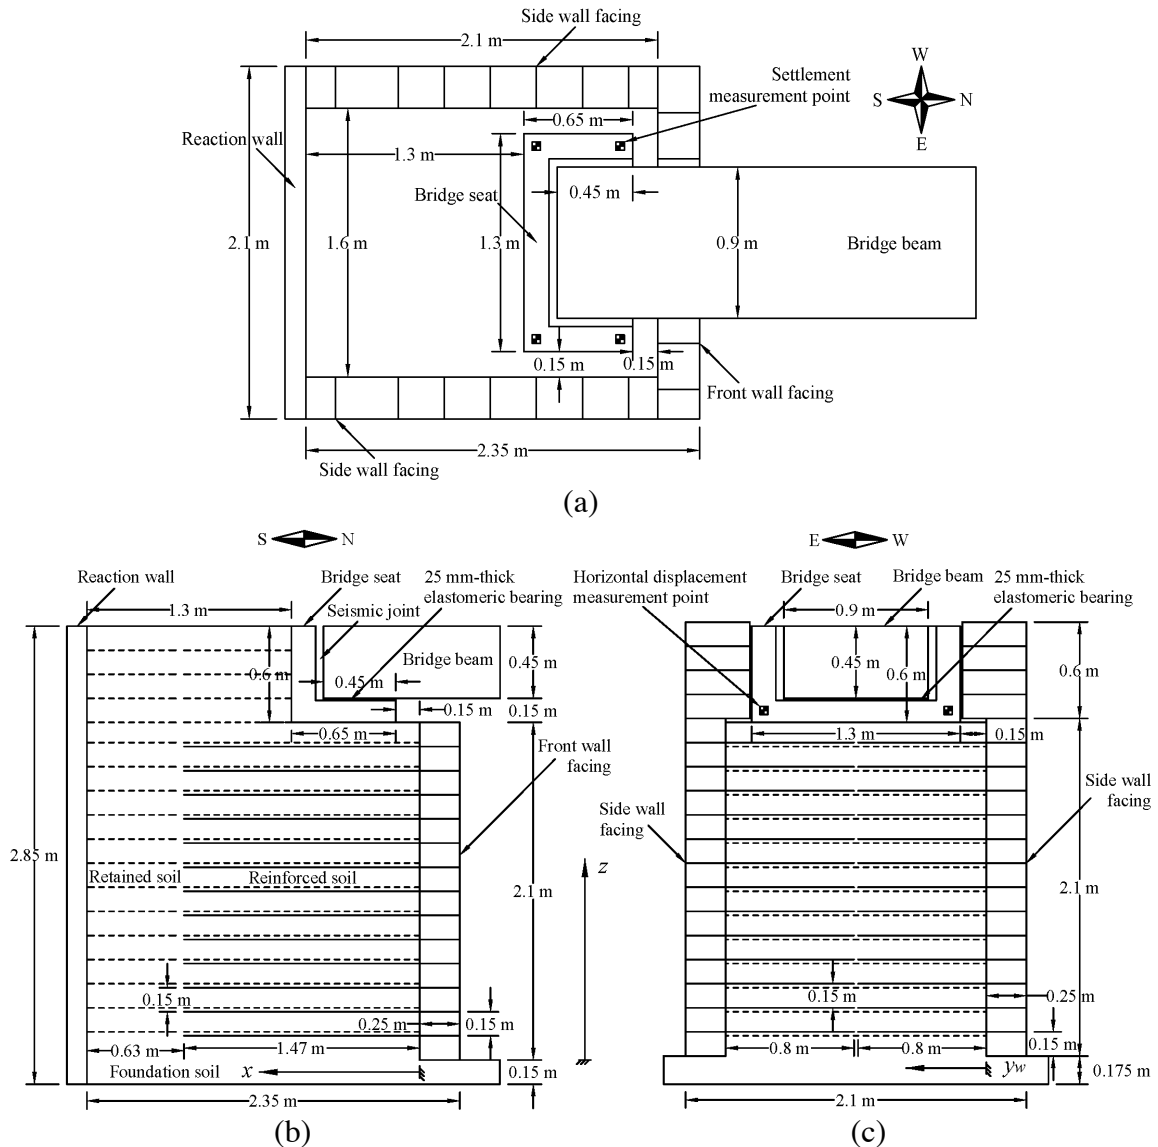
GRS bridge abutment model for longitudinal test: (a) top view; (b) longitudinal cross-sectional view; (c) transverse cross-sectional view. Note: dashed lines indicate reinforcement layers perpendicular to diagram.
